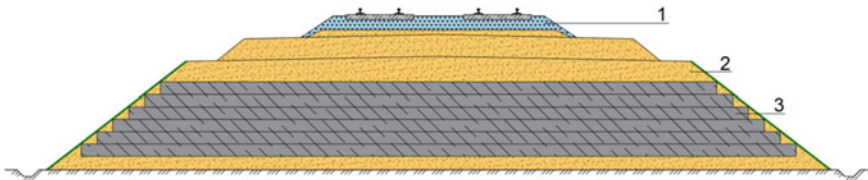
Railway embankment with the use of the foam concrete developed: 1 ballast layer; 2 embankment soil; 3 non-autoclaved foam concrete of medium density D500
